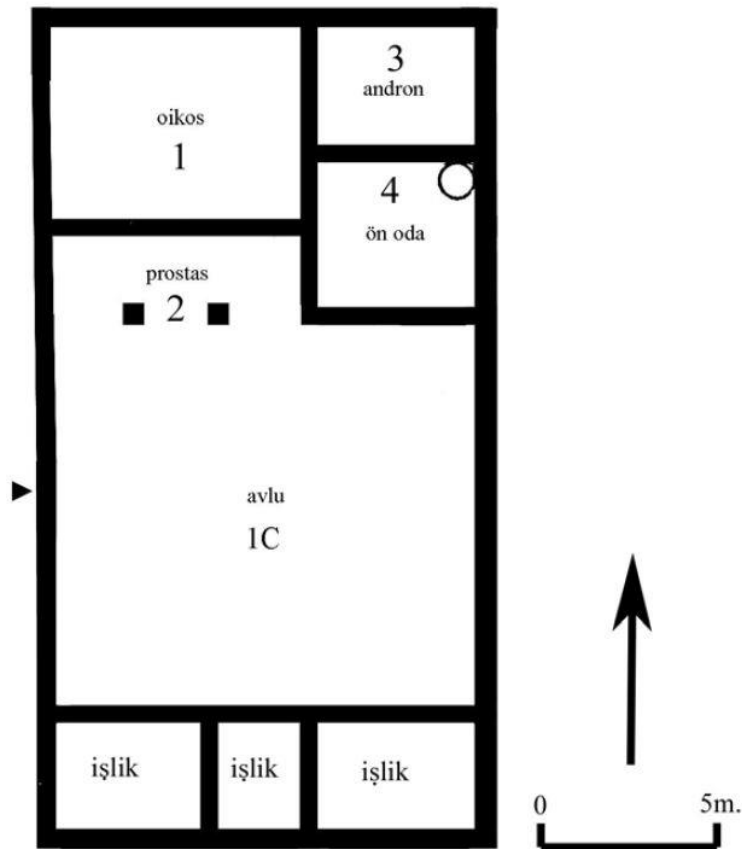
Klazomenai type 2 house plan. (Özbay 2018, 124)
